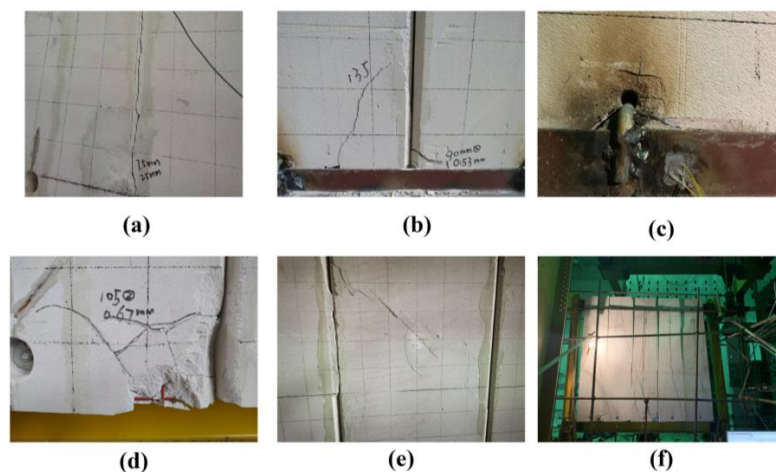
Images depicting the results of the loading test used for specimen SF-1: (a) splicing of the AAC wall panel due to mortar cracking; (b) mortar falling off from the spliced AAC wall panel; (c) cracks in bolt holes; (d) AAC wall panels damaged at the corners; (e) oblique cracks in the middle of the AAC wall panel; (f) overall view of the wall panel frame after the test.
